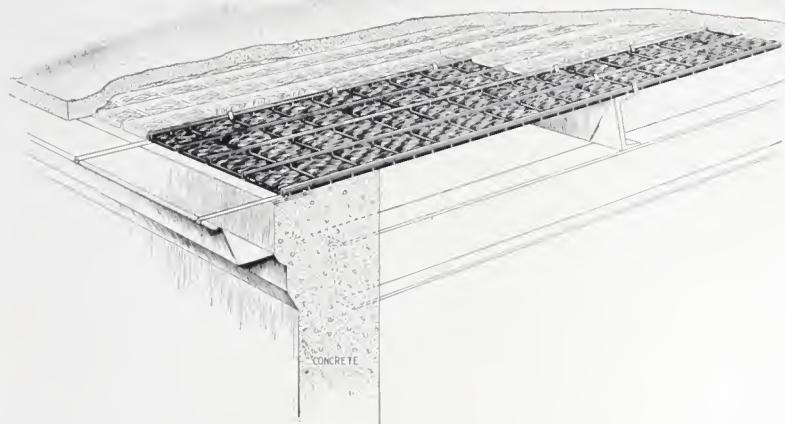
RIB-TRUS Plates Showing Proper Method of Application
